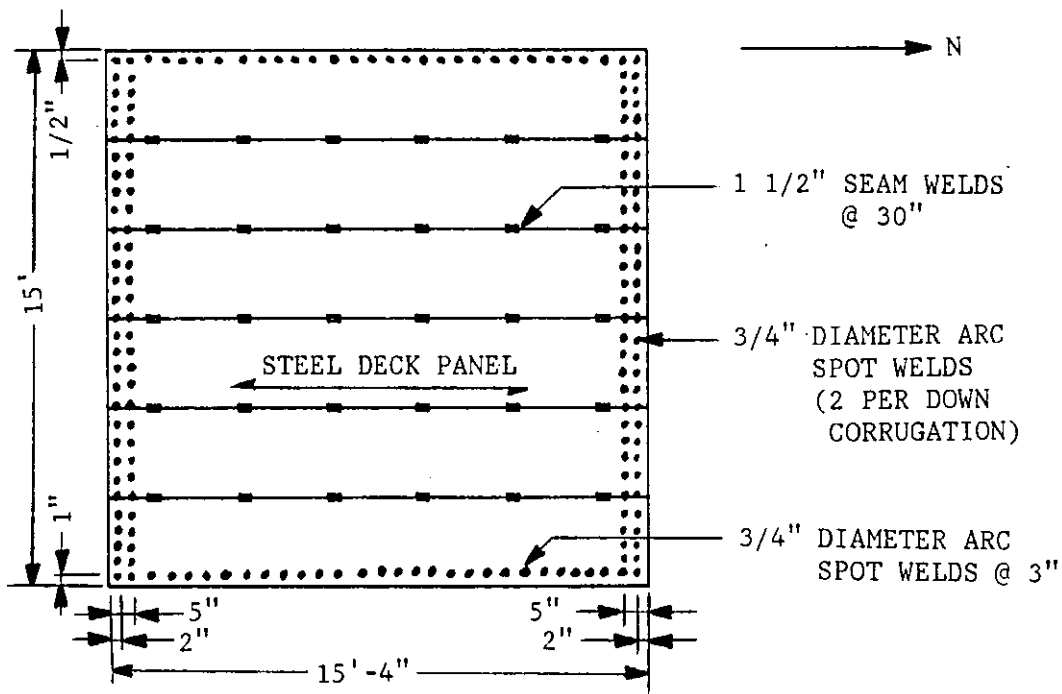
Plan view of edge connector layout for Slabs 15 and 16
